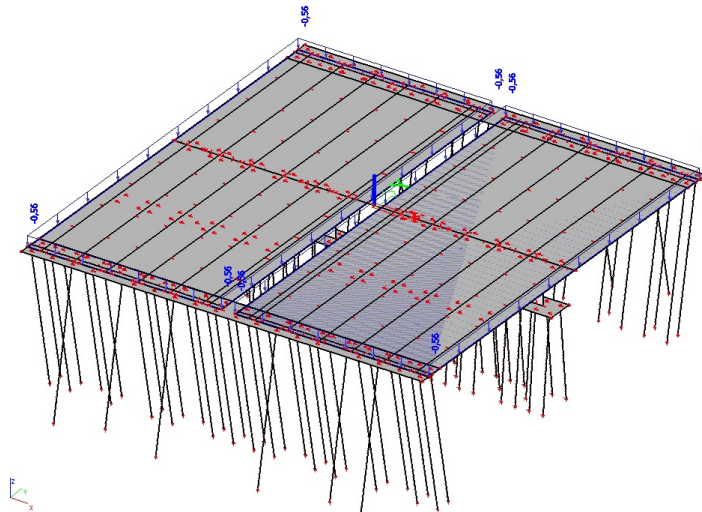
Snow load acting on the concrete deck in SCIA
